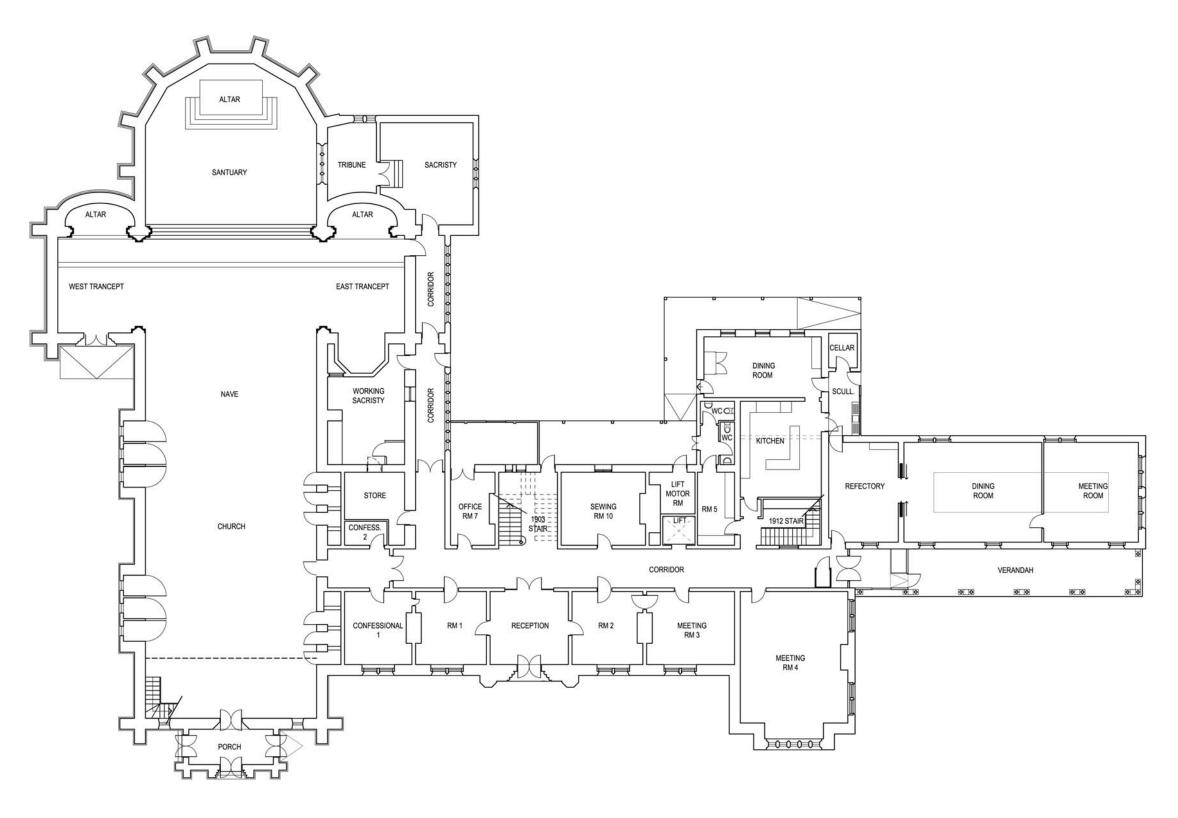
Ground floor plan of *Redemptorist Monastery and Church*. Plan is for diagrammatic purposes only. *Philip Griffiths Architects August 2010*.
